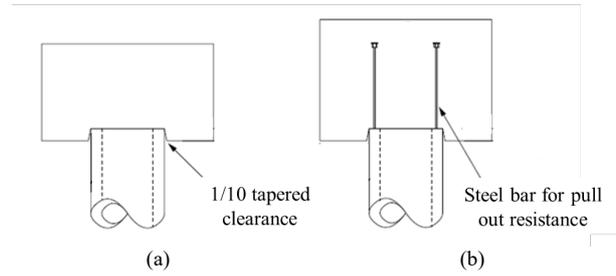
Improved simple connections (a) bearing pile, and (b) tension pile.
